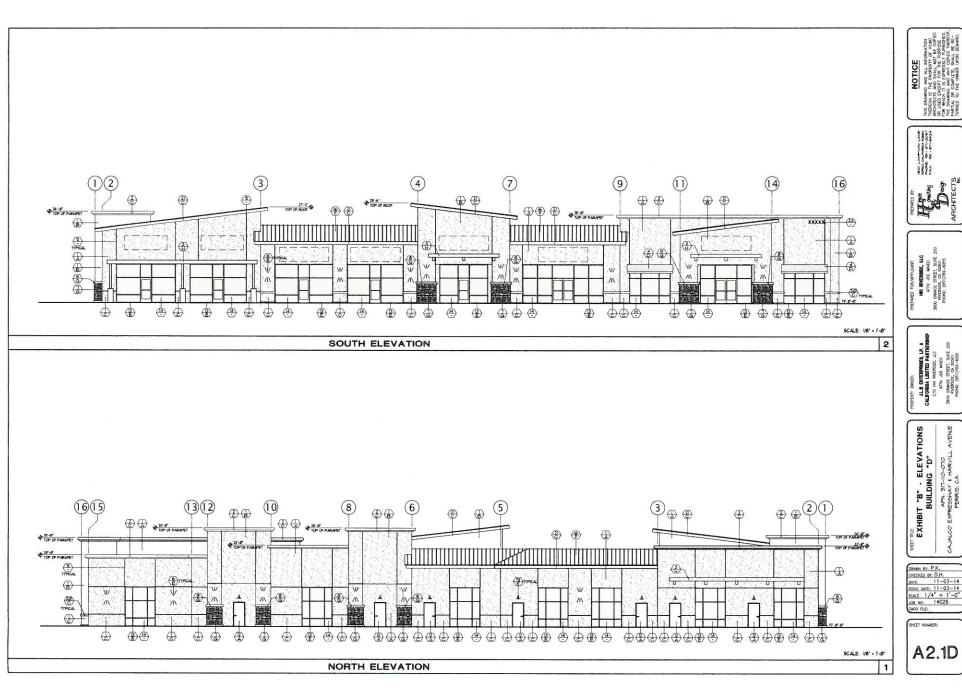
EXHIBIT "B" - ELEVATIONS BUILDING "D"
